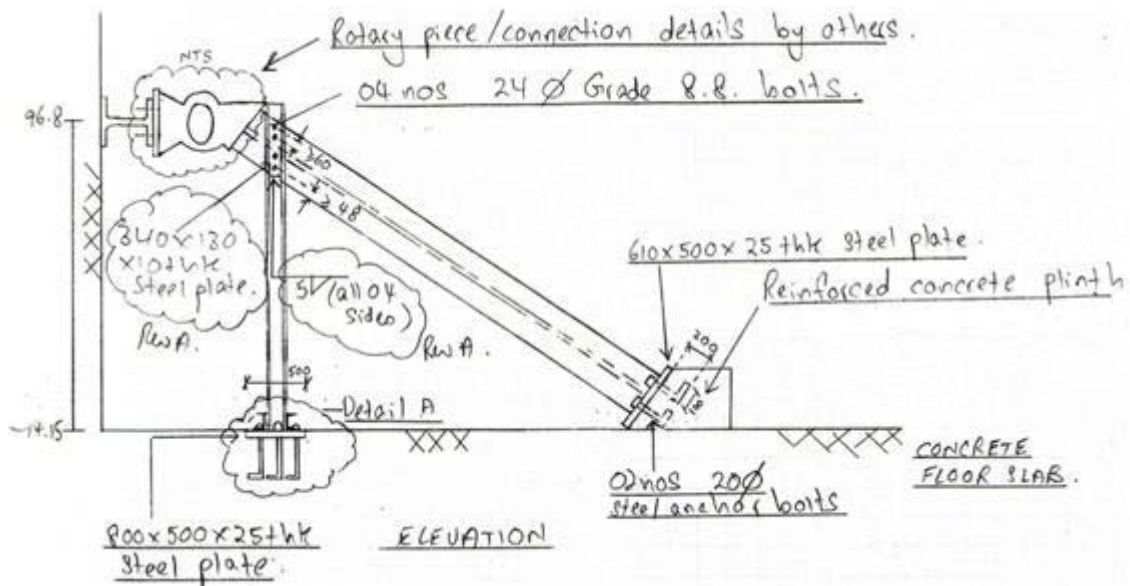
Inclined replacement strut to support RC cantilever walls during bottom-up construction.
